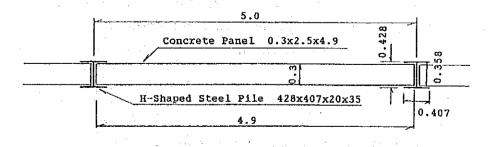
Structural Plan of Submerged Walls
